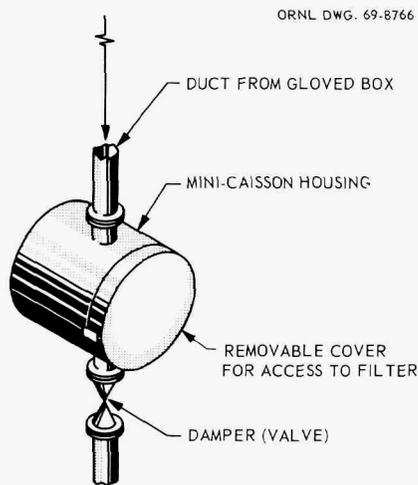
Typical connections for a Mini-Caisson housing.
